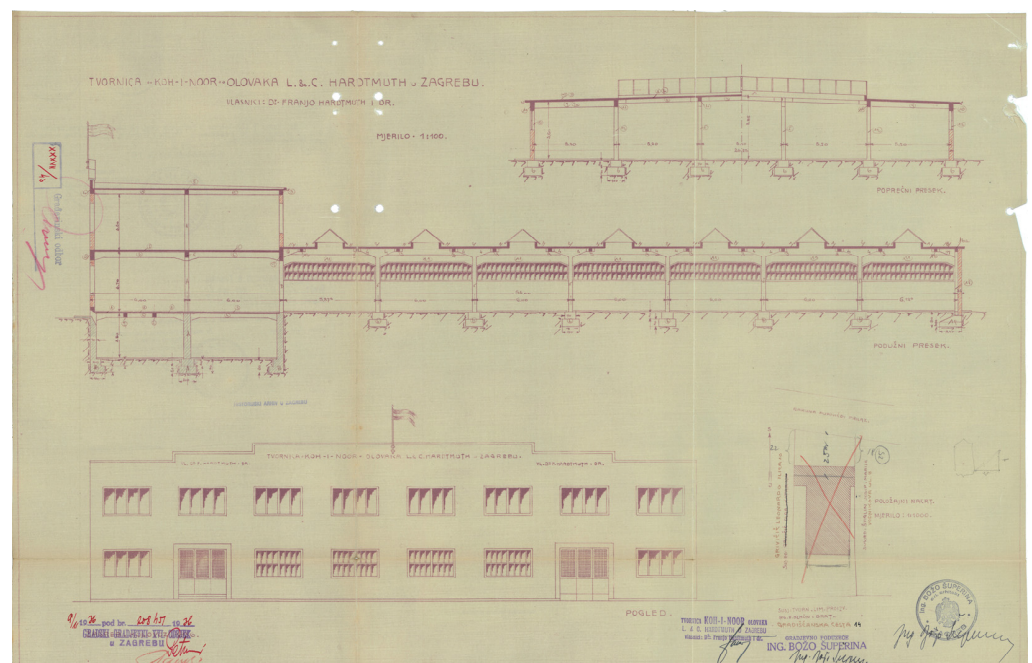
The pencil factory 'Koh-i-noor L. & C. Hardtmuth' in Baruna Filipovića Street, Zagreb, 1936, sections and street façade 1:100. Source: State Archives in Zagreb (HR-DAZG-1122 ZGD TOZ-3245).
